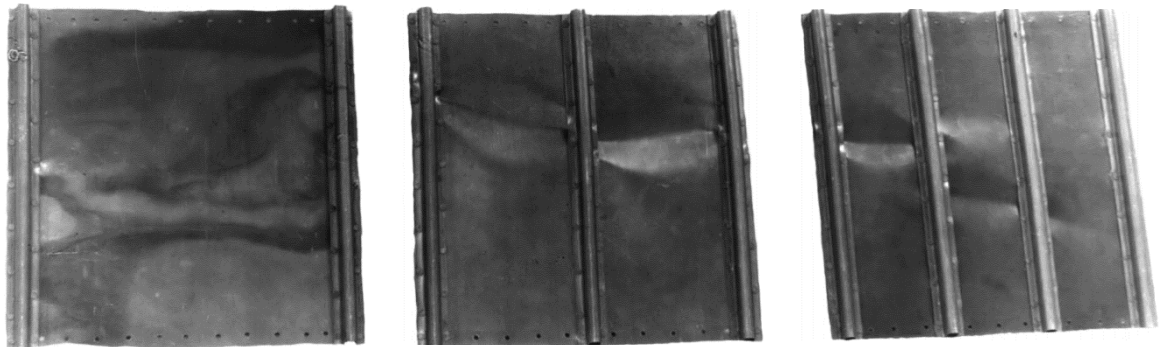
Failure mode by bending of the stiffener and sheet panel (from Gall [100])
